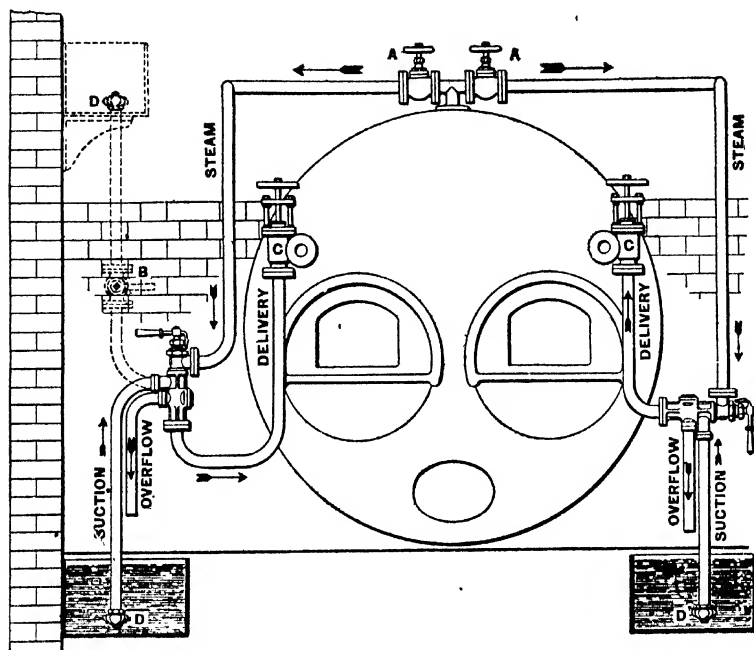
ALTERNATIVE METHODS OF FIXING INJECTOR FOR BOILER FEEDING
